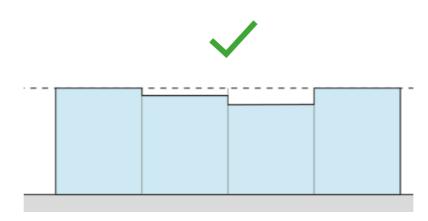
Diagrammatic elevation showing flat stepped roofs
